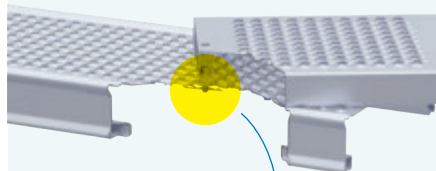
DETAIL: ALBLITZ ACCESS DECK (CHEQUER PLATE DECKING)
